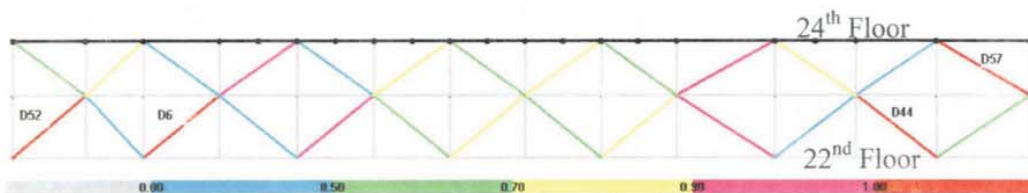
South Belt Truss between floors 22 and 24 diagonal diagram
